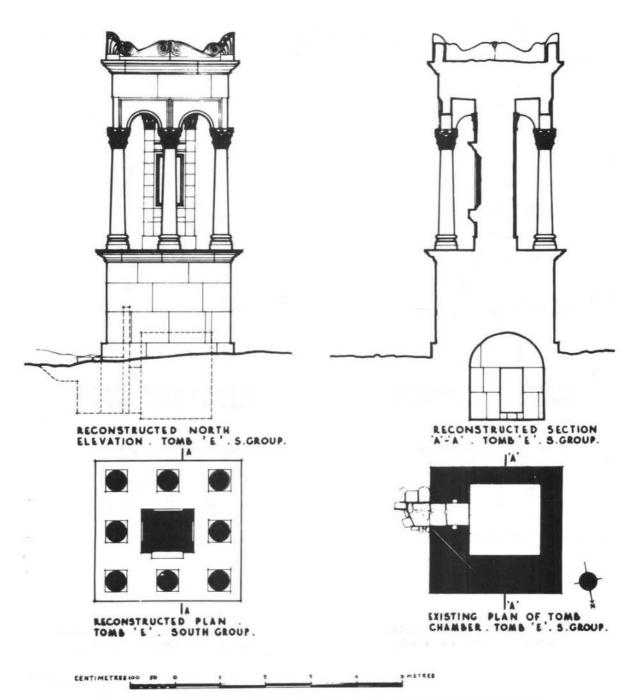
Tomb South E: north elevation, plans and section. Drawn by J. Keelan.
